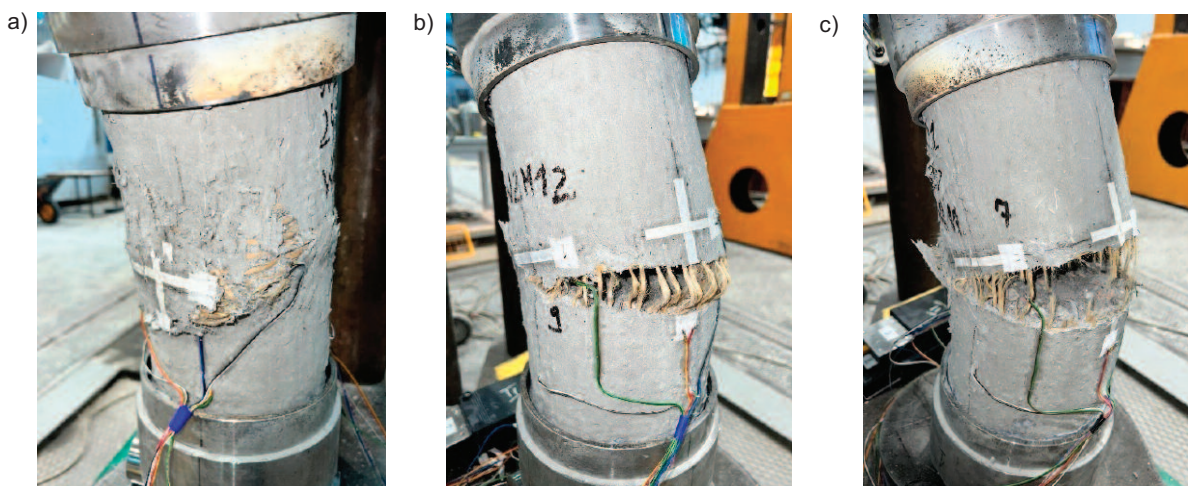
Failures of eccentrically compressed reinforced specimens: a) concrete crushing in the compression zone; b) fibers slip in the tension zone; c) secondary fibers rupture in the tension zone
